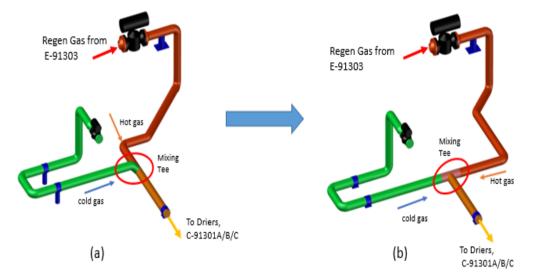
(a) conventional intersecting mixing tee and (b) proposed colliding mixing tee in MLNG plant.
